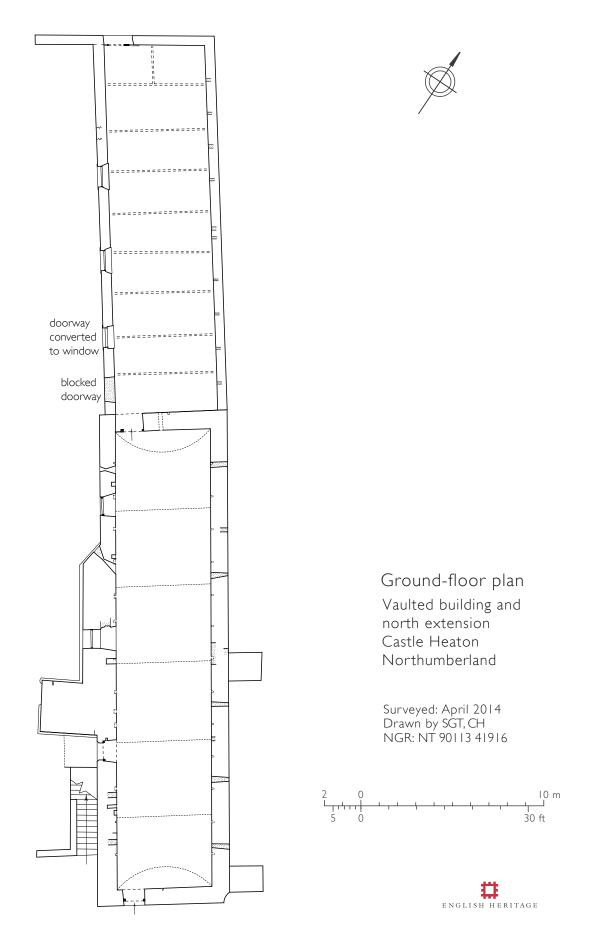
Ground-floor plan of the vaulted building and the north extension, © English Heritage.
